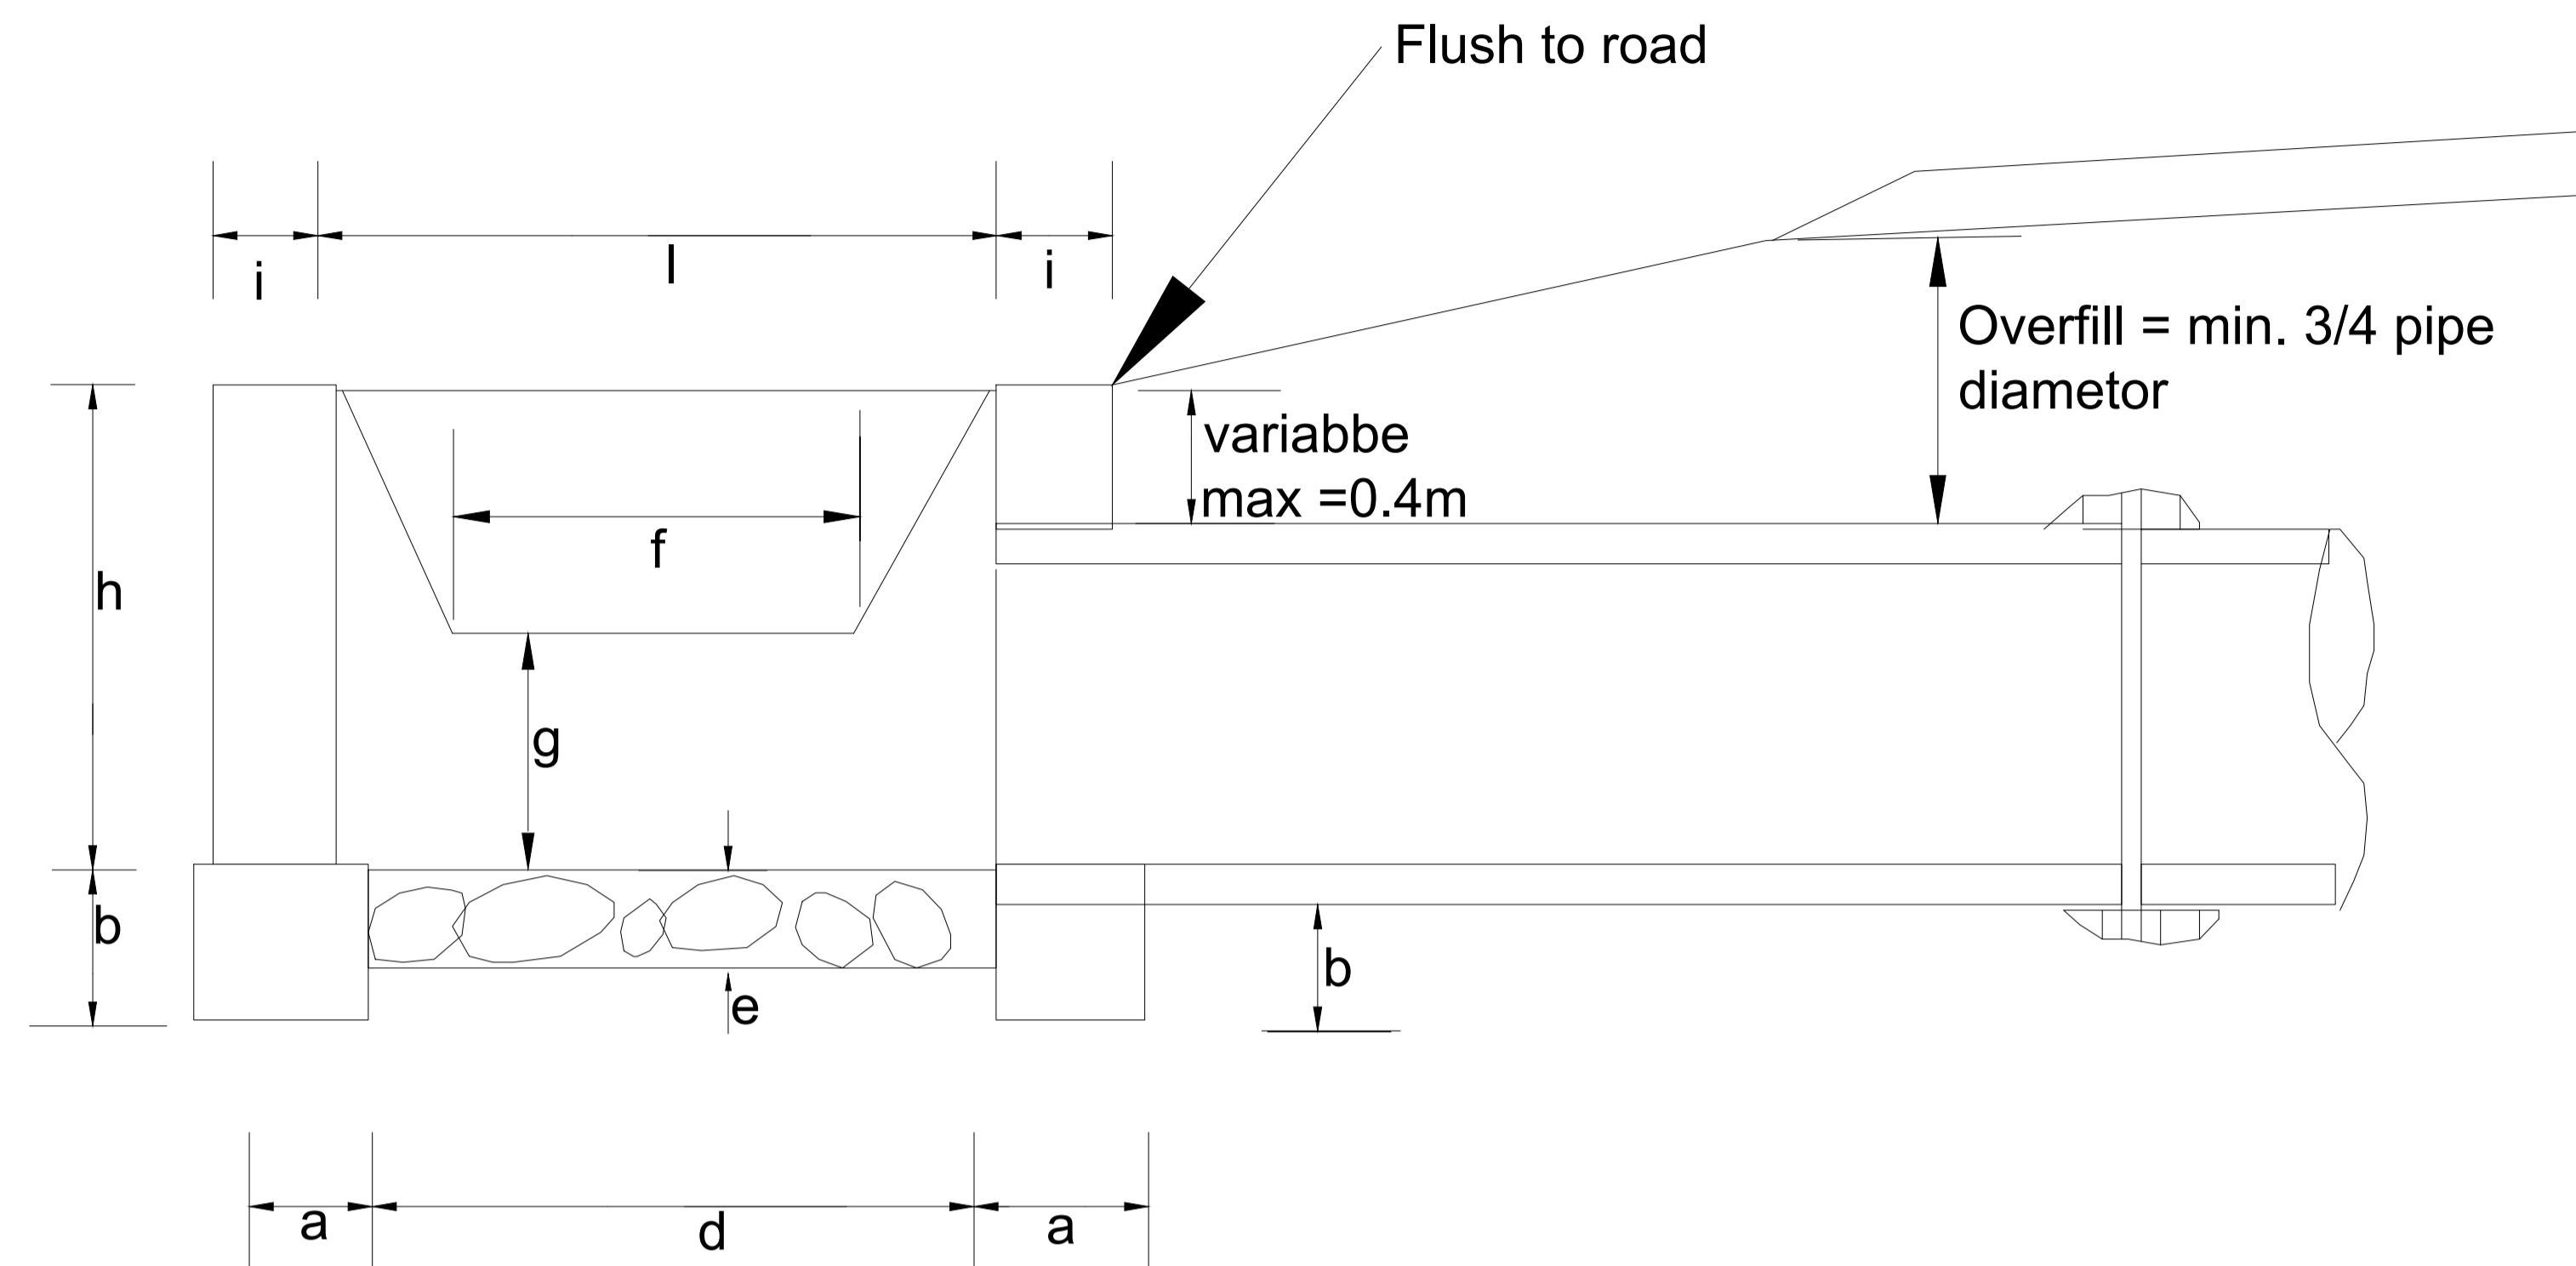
HEADWALL TYPE 1 (HEAD AND WINGWALLS)
